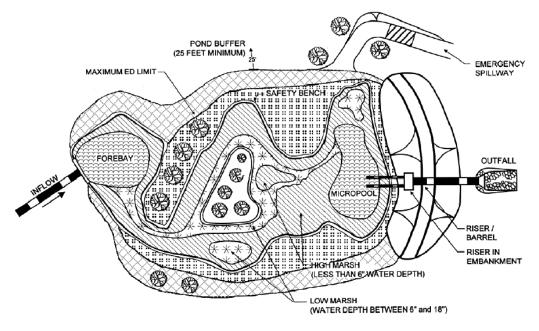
Plan View of Hydrologic Zones around Stormwater ED Shallow Wetland
